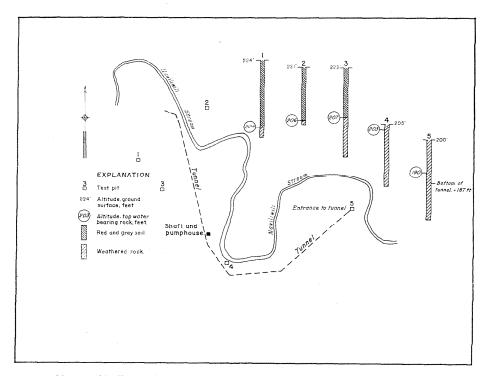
Plan of tunnel 8, Lihue Plantation Co. Nawiliwili tunnel,
